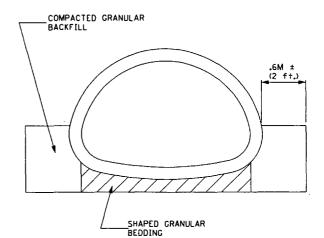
Details of structural design, Class IV pipe, 1967.
